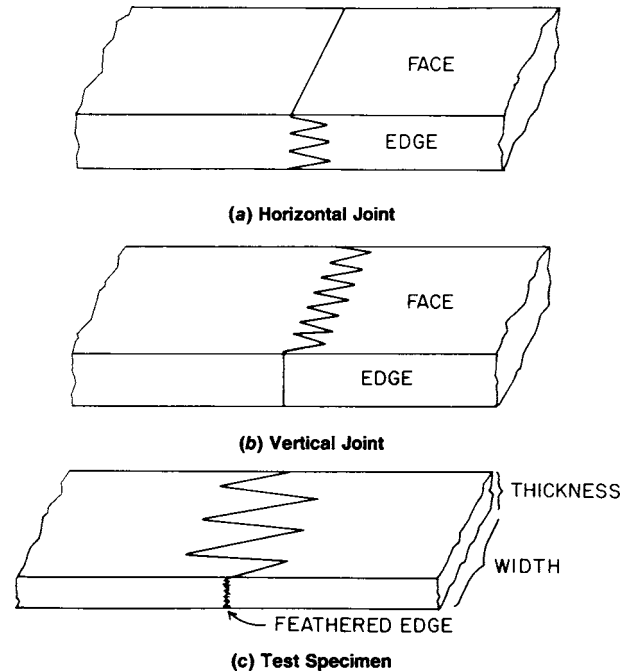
Finger Joint Assembly and Specimen Descriptions
